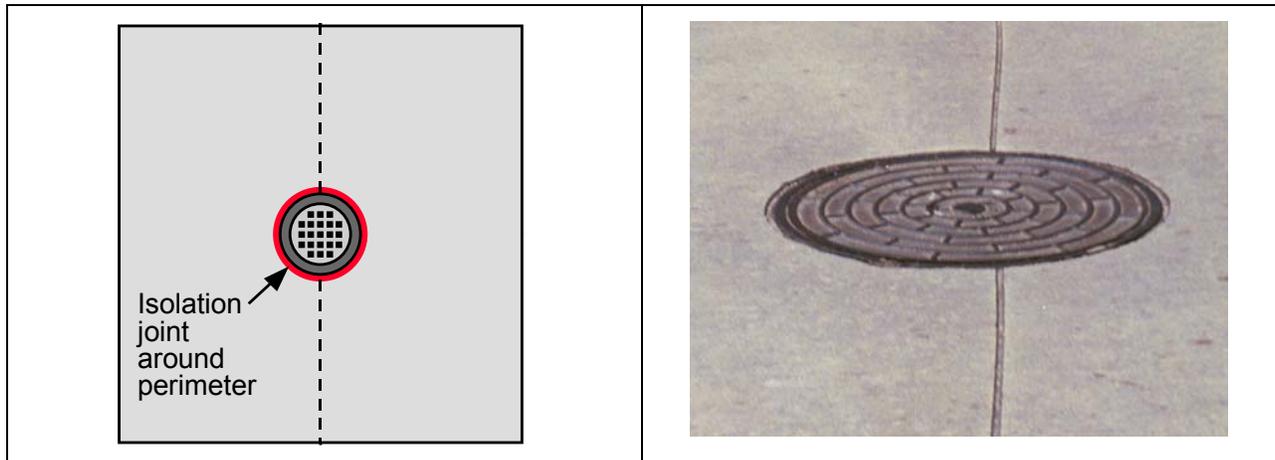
Manhole requiring only an isolation joint (figure courtesy of American Concrete Paving Association. Photo taken in Newport, Rhode Island).
